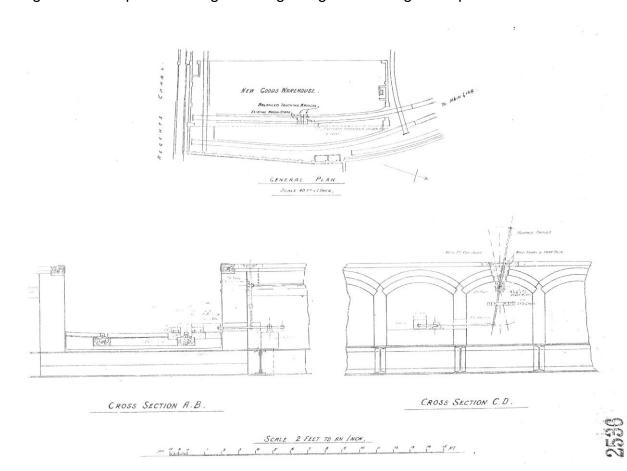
Detail of proposed additional Wagon Stop, 1923
